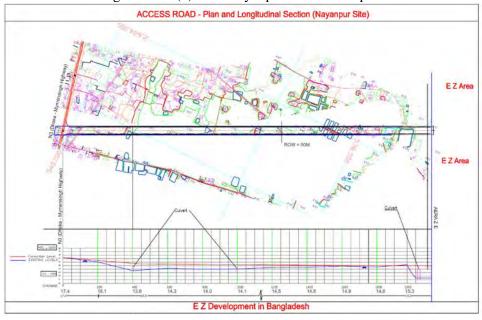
(4)-2 Planned section of the Nayanpur access road (op-1)
